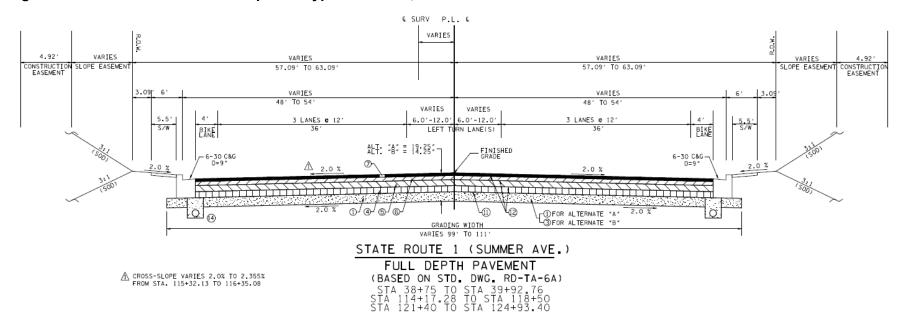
SR-1/Summer Avenue Proposed Typical Section, at Dual Left Turn Lane Locations
